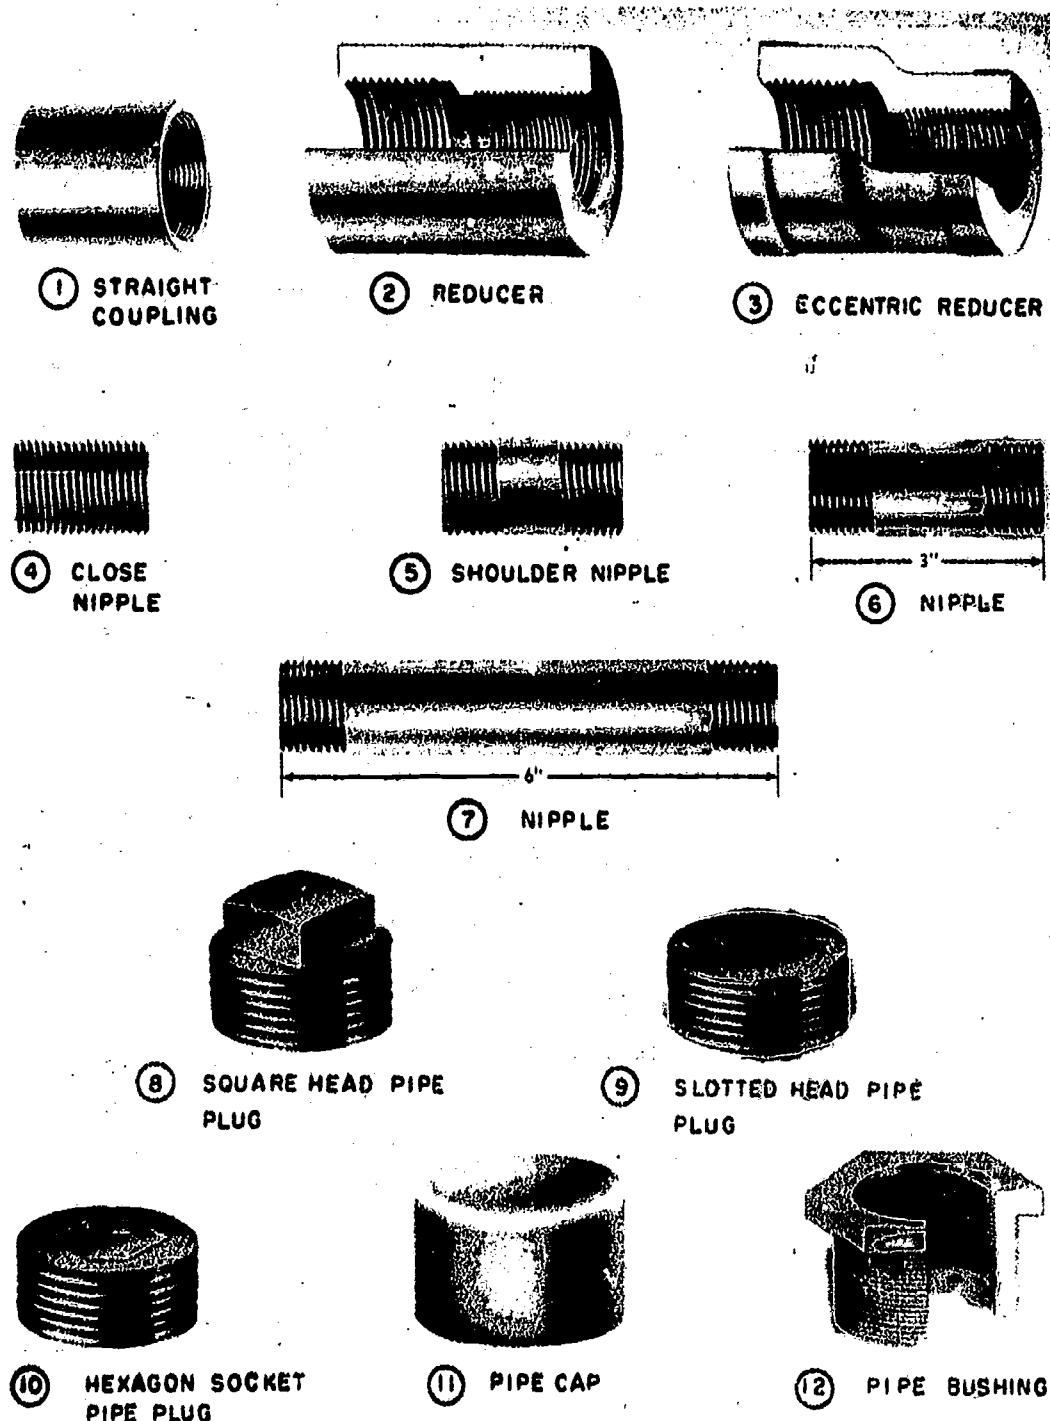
Types of iron pipe couplings, nipples, plugs, caps, and bushings.
